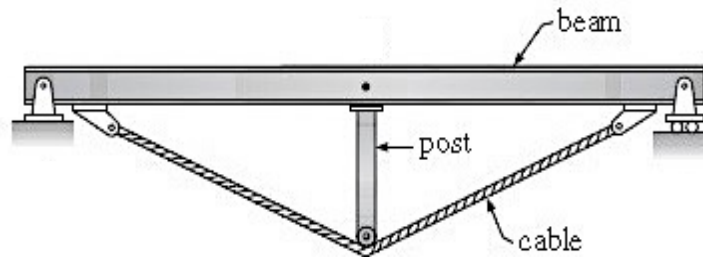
Structural components of an inverted king-post truss (Leet et al., 2010)
